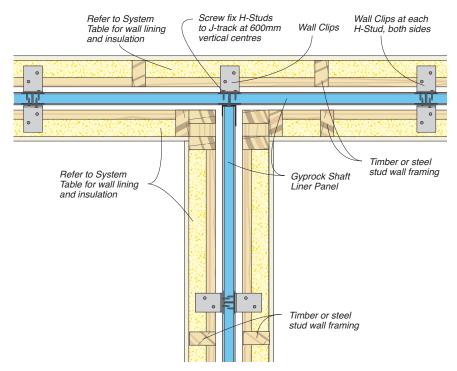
Junction Of Party Wall to Party Wall at T-Intersection (Option 2) - Plan View
